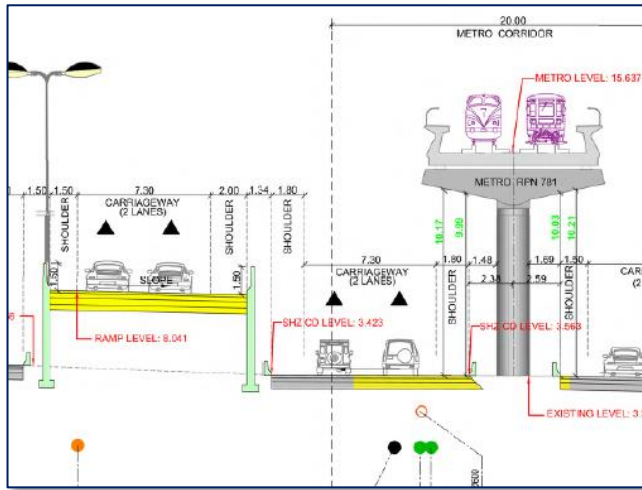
Road Bridge Cross sections interfaced with Rail Viaduct
